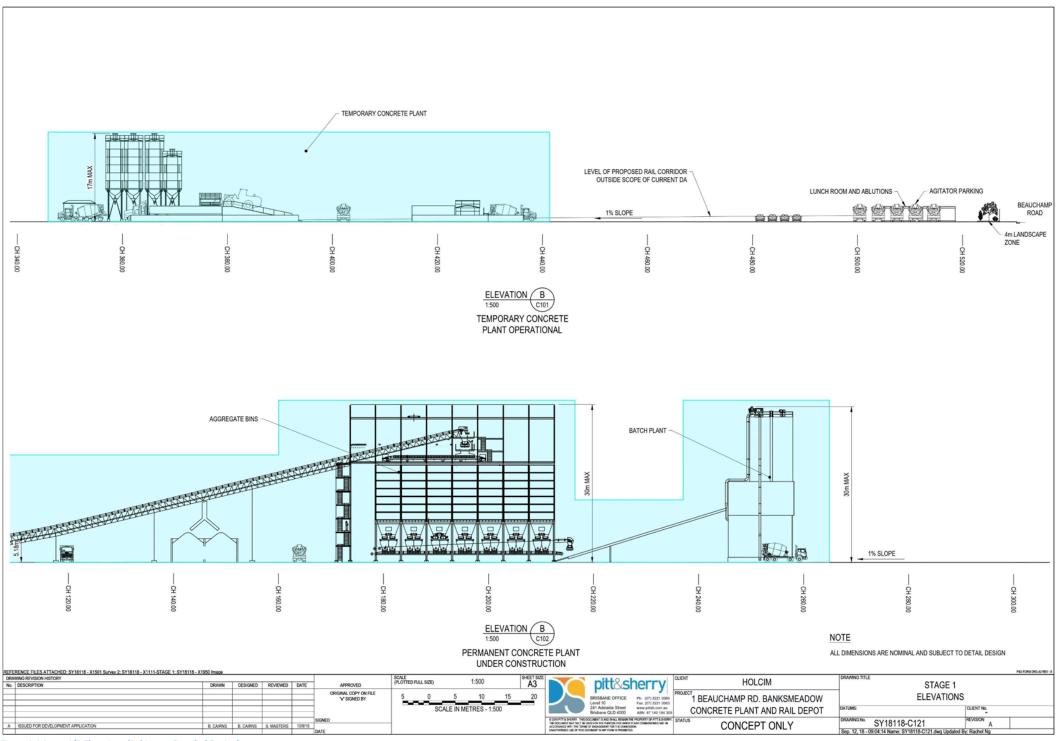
Stage 1/2 Elevations (Subject to Detailed Design)
